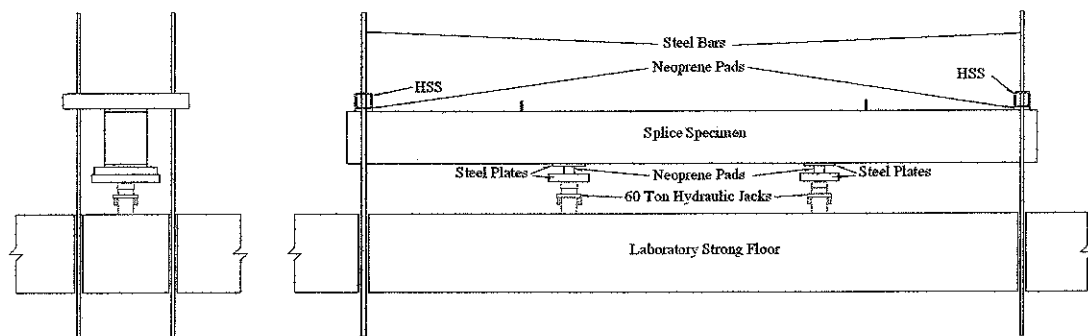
Illustration of Test Setup for No. 9 Splice Specimens
